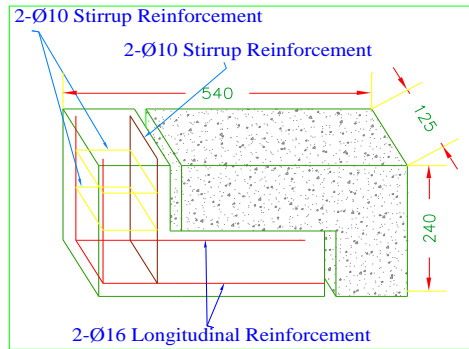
Rebar detailing of shear specimens (all dimensions are in mm unit).
